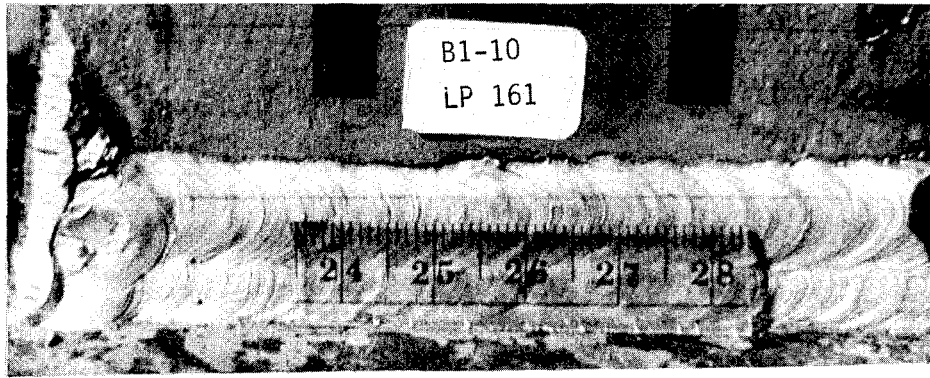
Crack Propagation Through and Across Flange, Specimen B1-10
